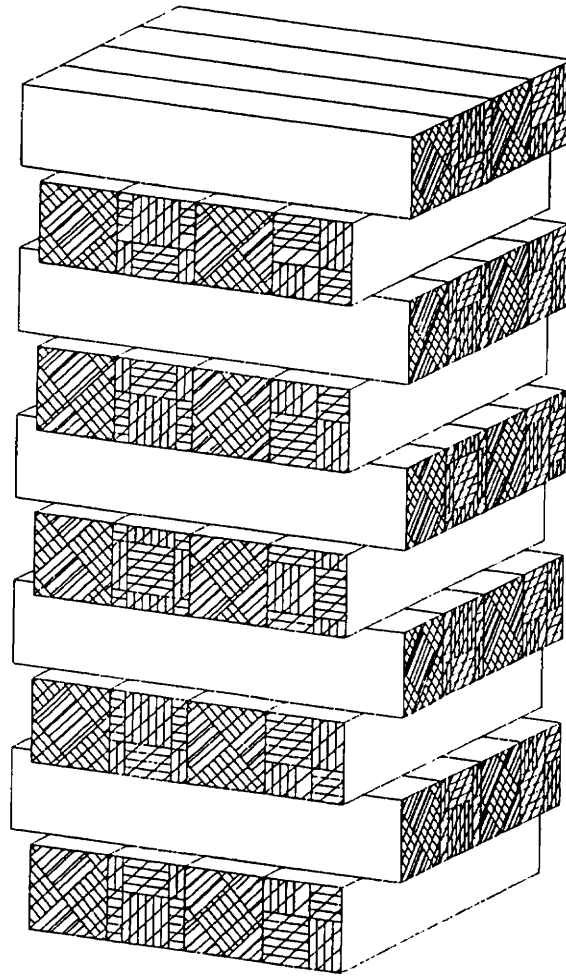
Sixteen-point standard wooden crib formed from a four-timber-per-layer square configuration.
